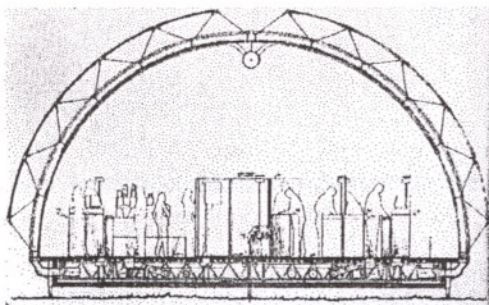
IBM Travelling, Piano; (source: Wigginton 1996)
